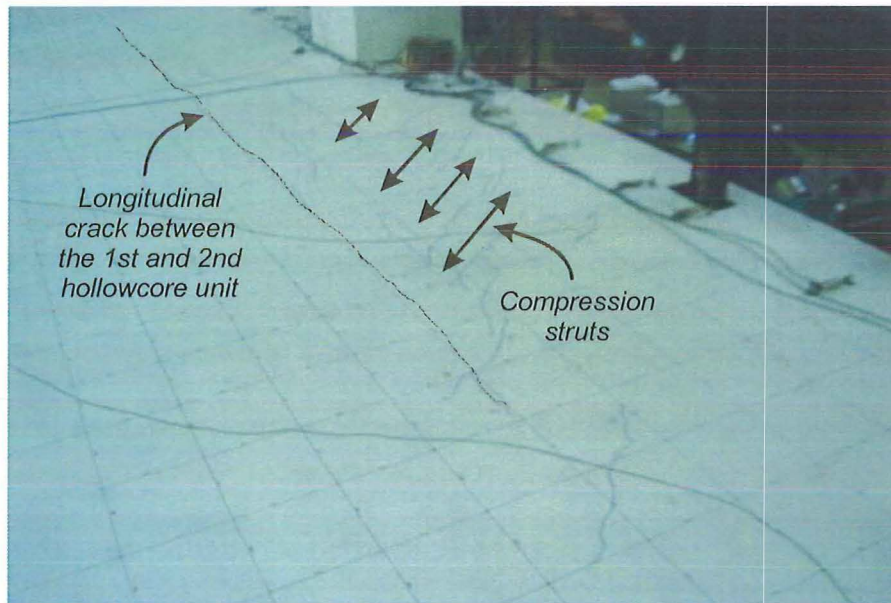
Shear lag cracks that have formed on the floor diaphragm.
